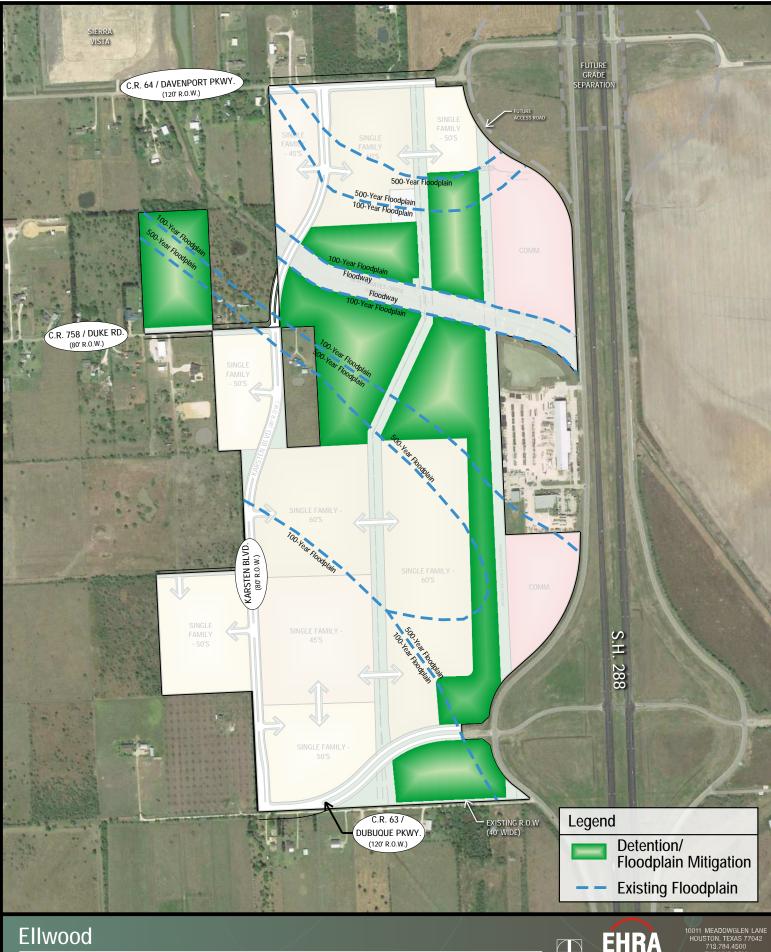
Storm Water Detention and Floodplain Mitigation Plan
